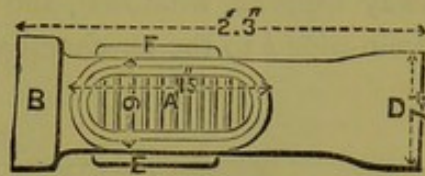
Plan of a 6-in. "Ventilating Drain-syphon and Sewer-interceptor."
